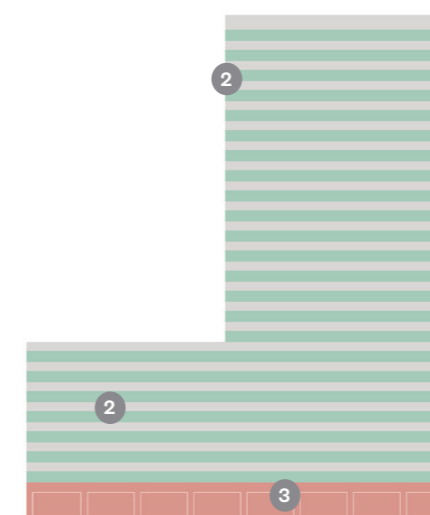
Building B1-2 - façade principles O2 (Illustrative)
